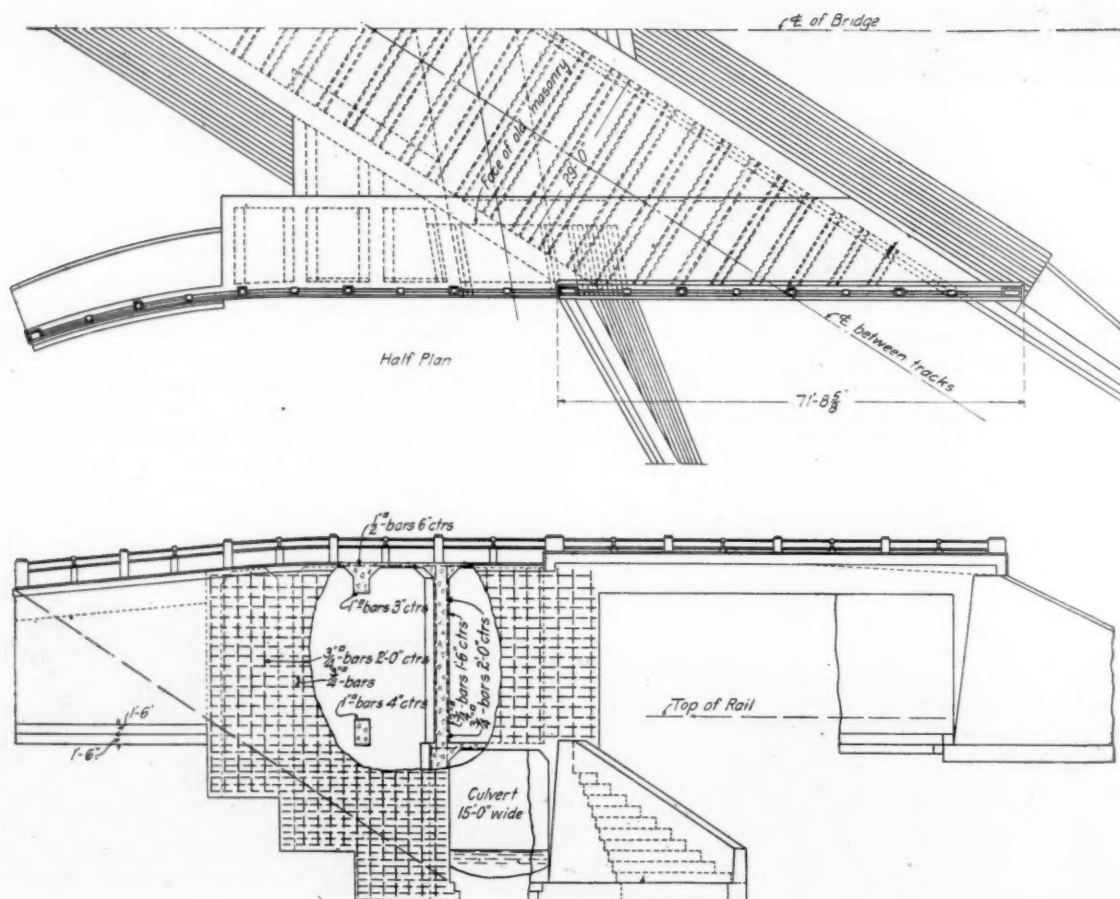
A Complicated Skew Crossing at Montclair, N. J., Involving Cellular Construction in the Abutments
